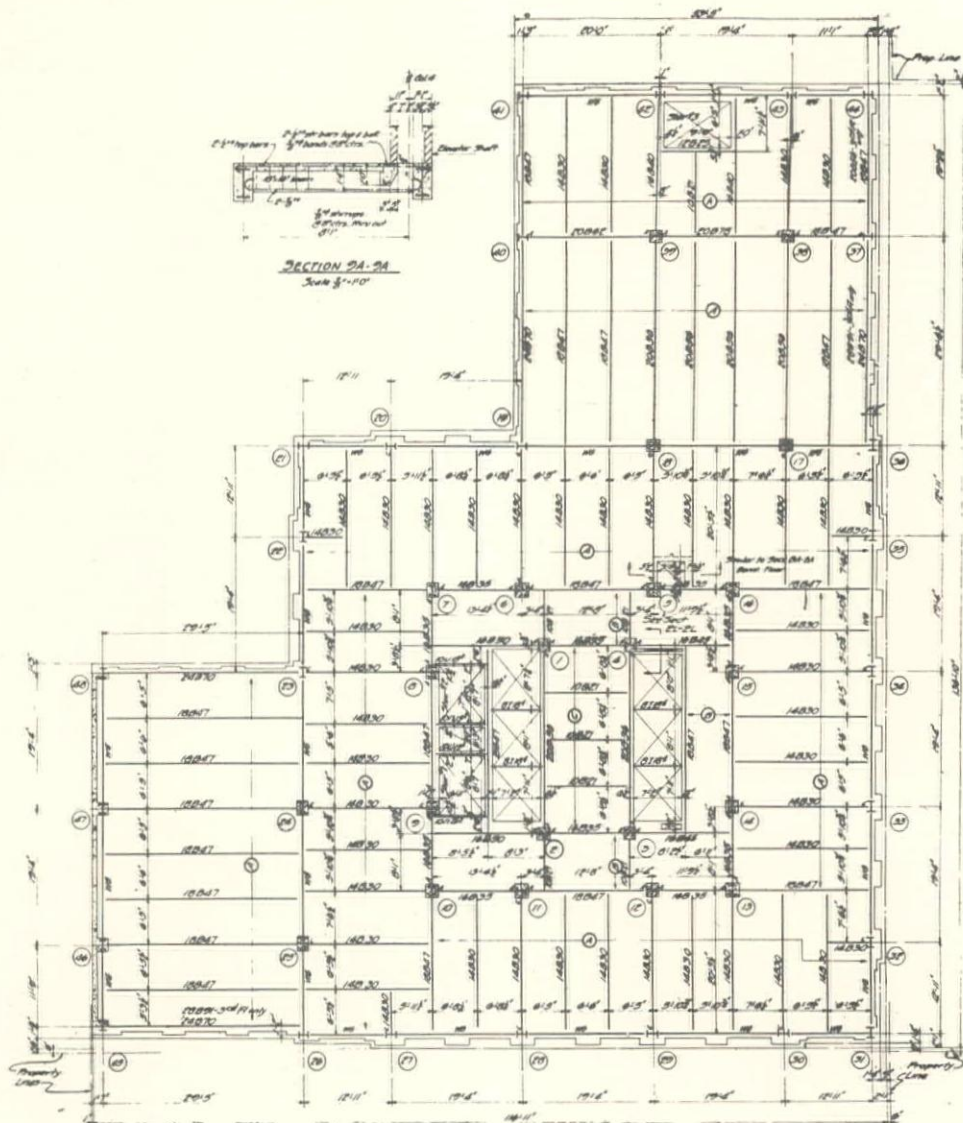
TYPICAL FLOOR FRAMING PLAN FOR THIRD TO TENTH FLOORS OF SHELL BLDG. TOWER WILL BE 88 FT. SQUARE
